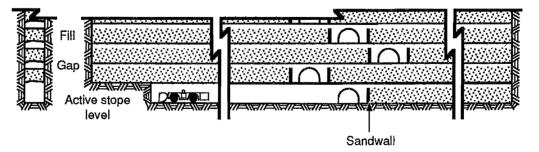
Backfill placement in typical underhand stope cross and longitudinal sections. Stope gradation for drainage and uneven backfill complicate filling operations.
